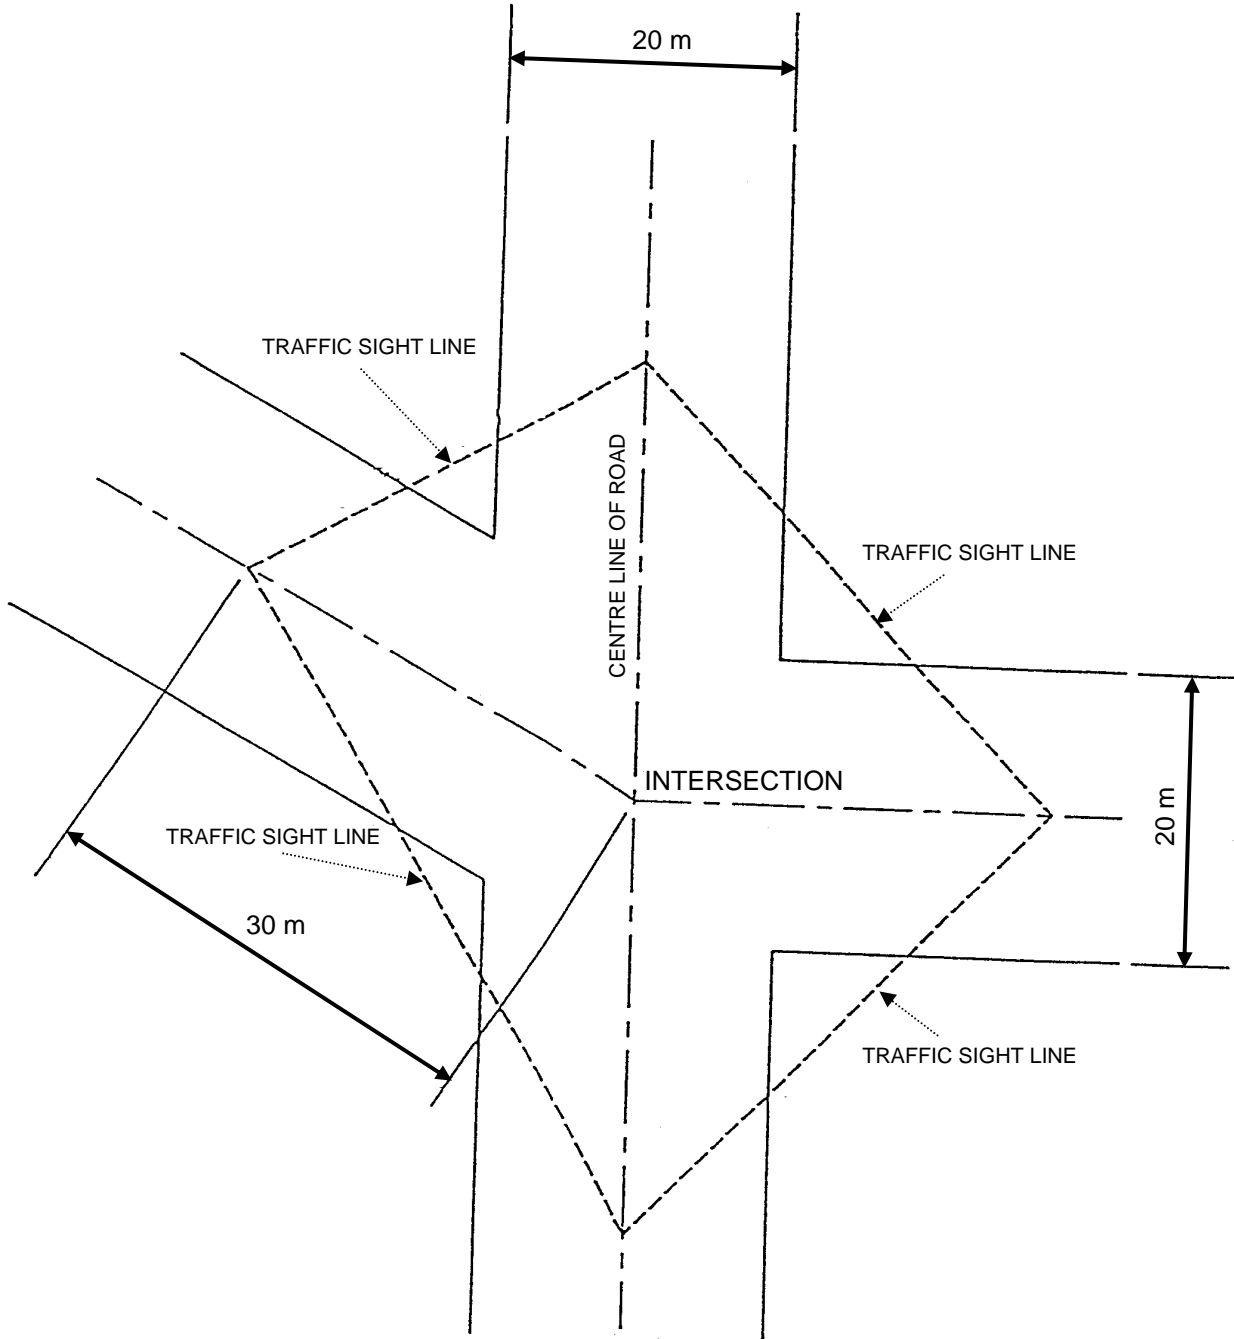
B CORNER SPLAY HUNUA ROAD AND BOUNDARY ROAD
